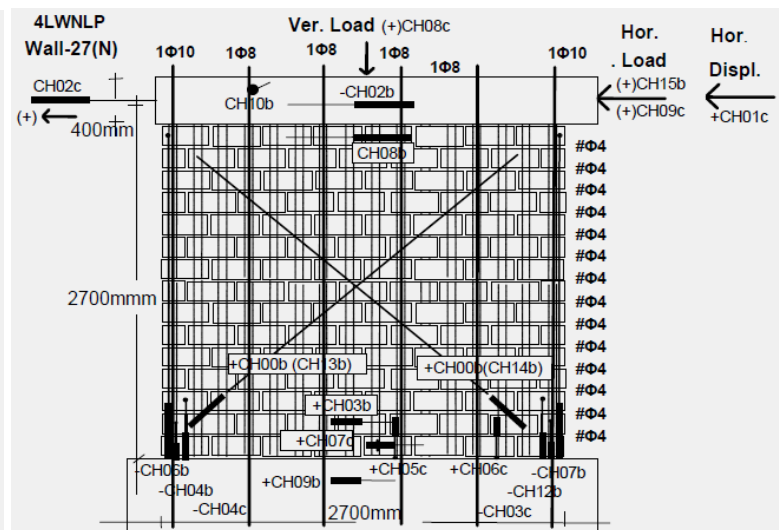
Typical reinforcing details of specimen Wall-27N and instrumentation scheme
